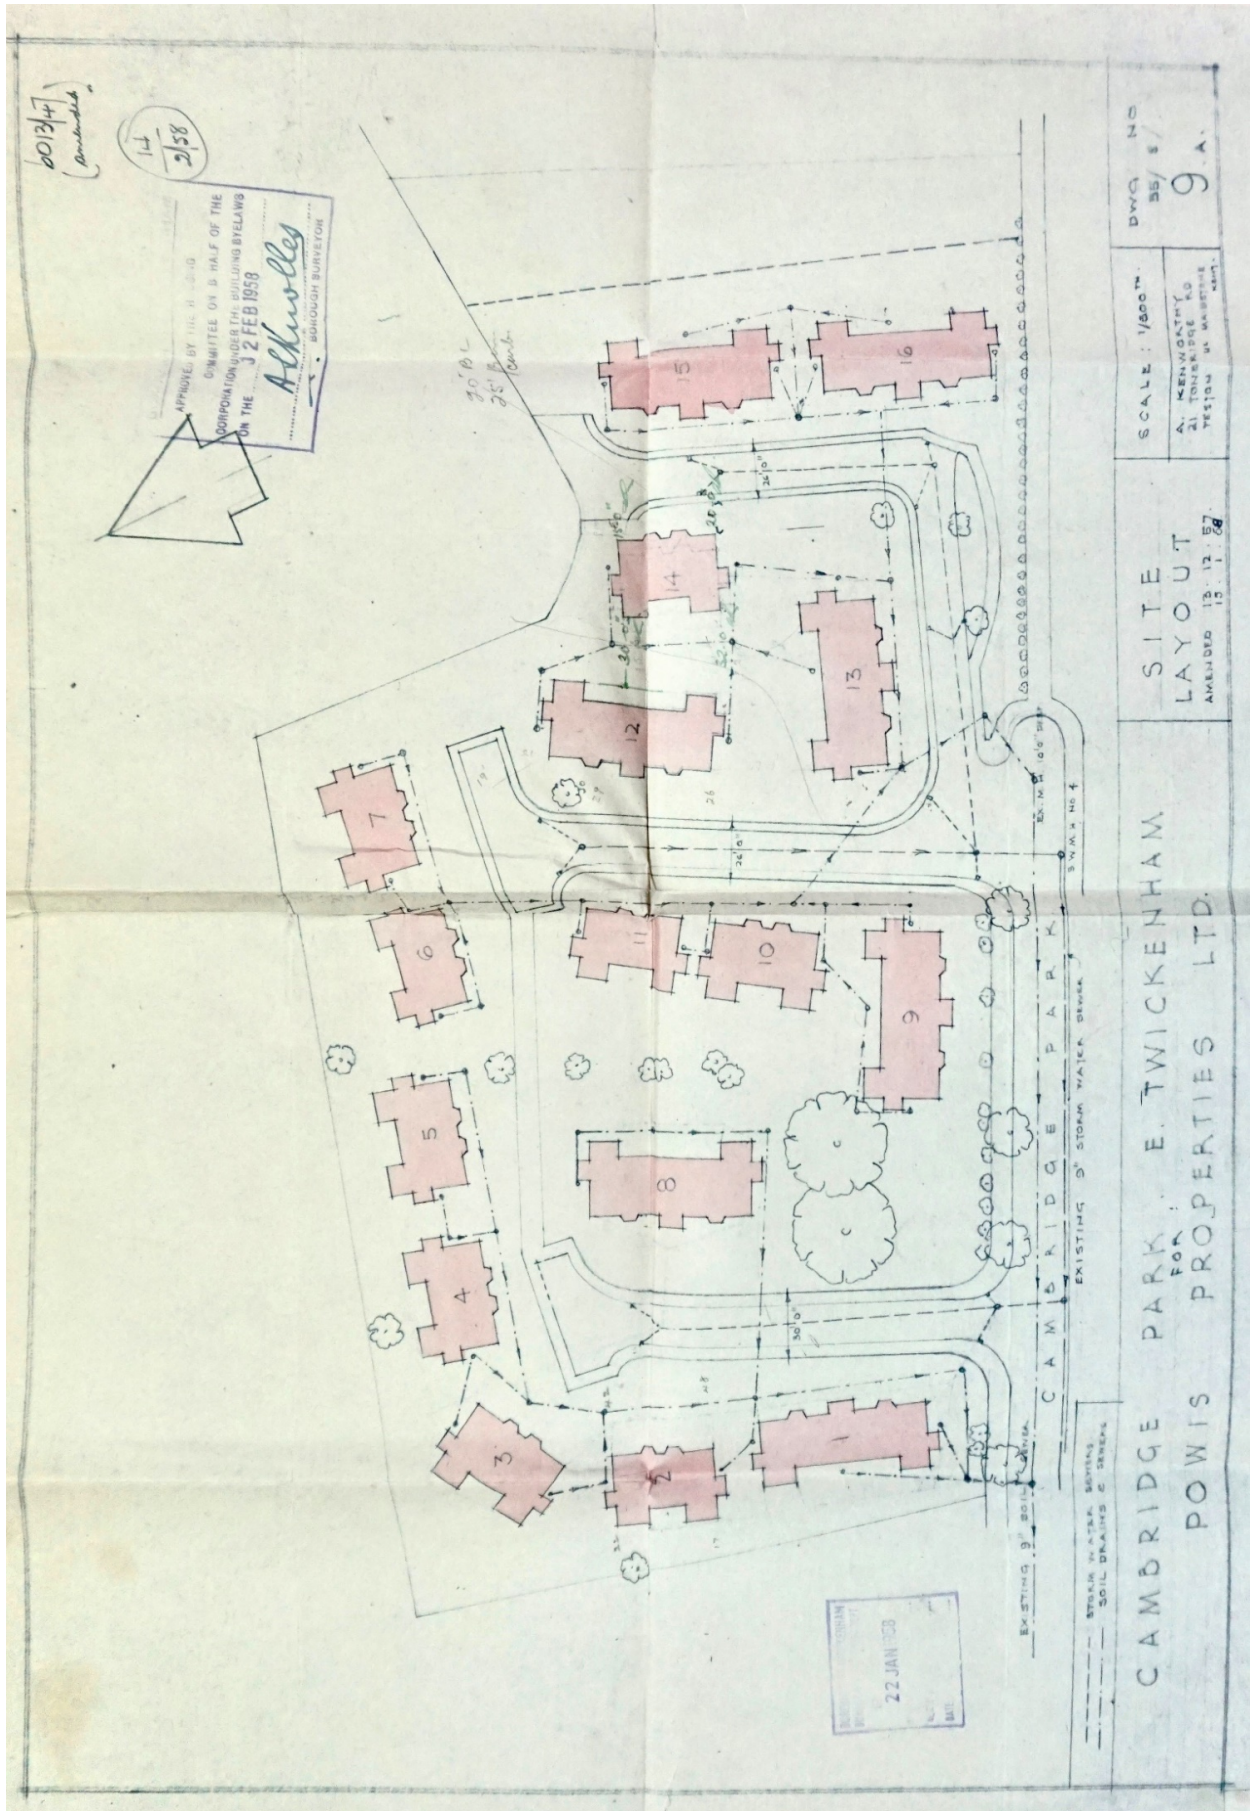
Reduced size copy of the Site Layout plan for Cambridge Park Estate submitted as part of the planning application by Powis Properties, with final approval granted on 12th February 1958.
